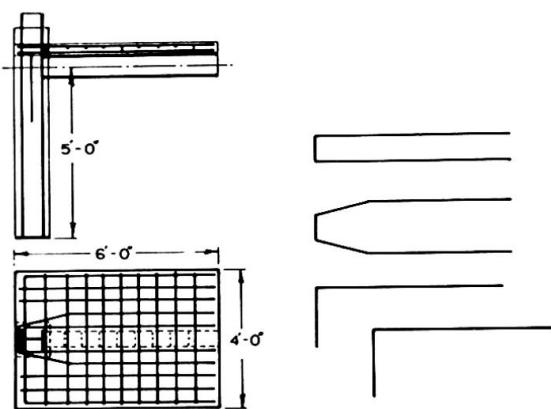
COMPOSITE CONNECTION REINFORCEMENT DETAILS
